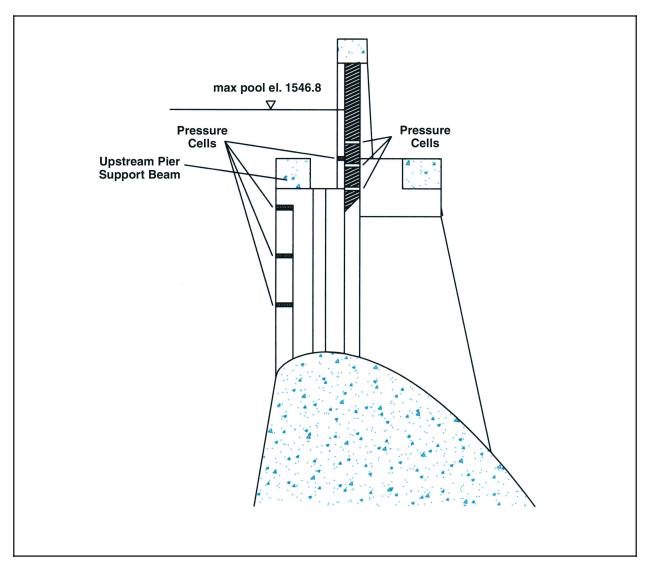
Cross section of spillway showing spill gate, pressure cell locations, and support beam
